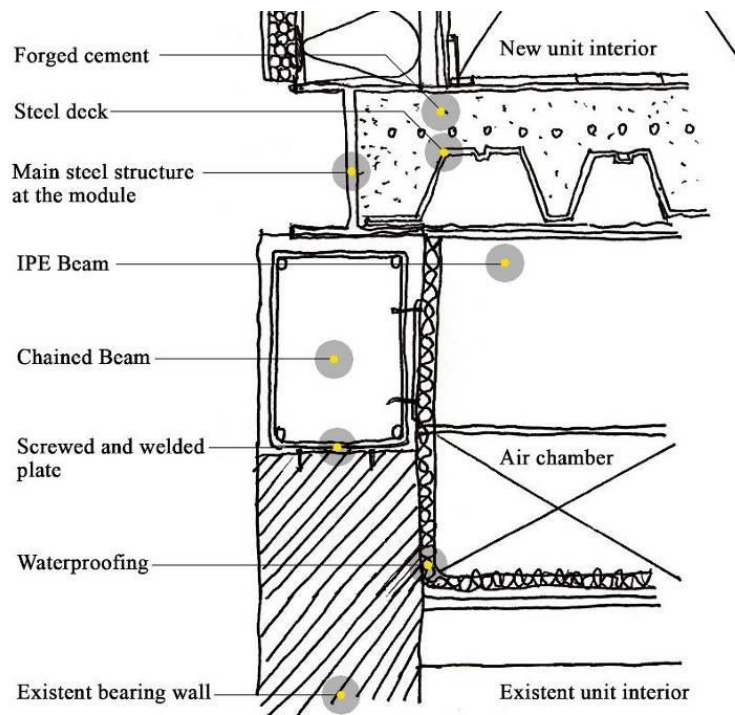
A sketch developed by the author representing the anchoring system between the building and module.
